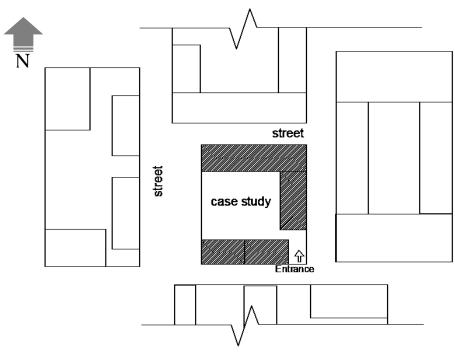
site plan of traditional building in Bushehr city (Memarian, 2006)
